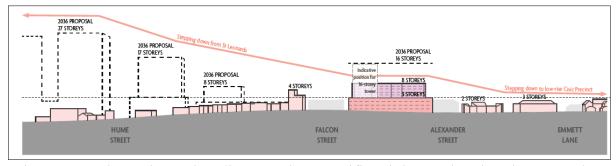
Schematic section diagram along Pacific Highway showing the 2036 Plan proposed heights around the "Fiveways Triangle" site
